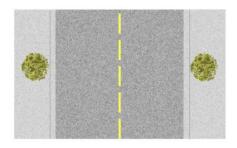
continued*Standard MPAH Cross Sections
